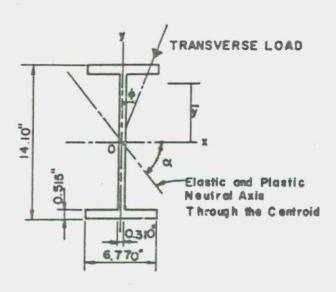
A-8 (b) Loading on beam section, Example 5A-8
